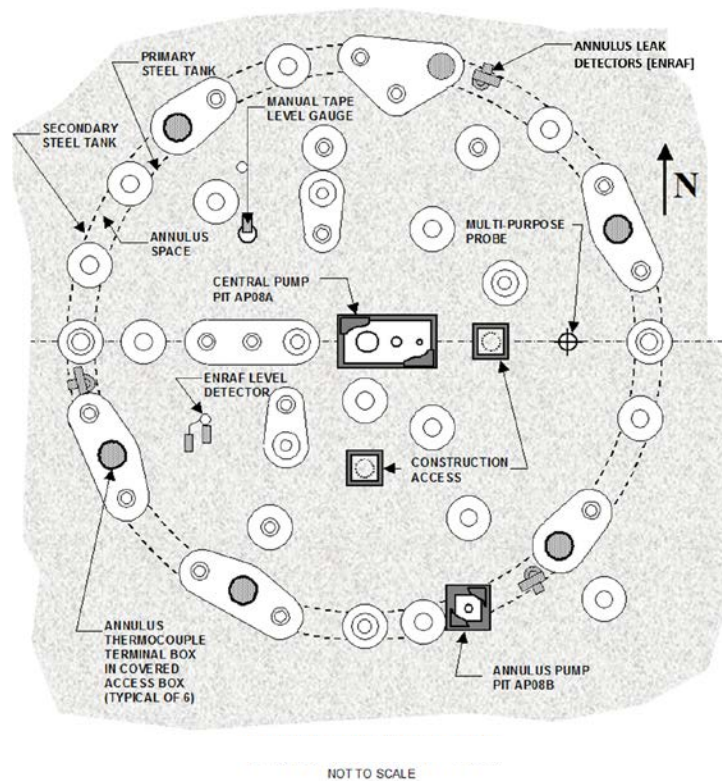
Tank 241-AP-108 Grade Level Plan View
